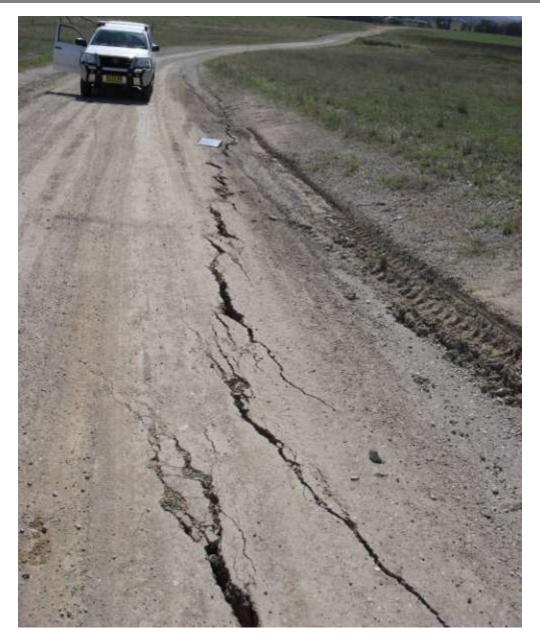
Gateroad cracks in the access road looking north. Remediation required.
